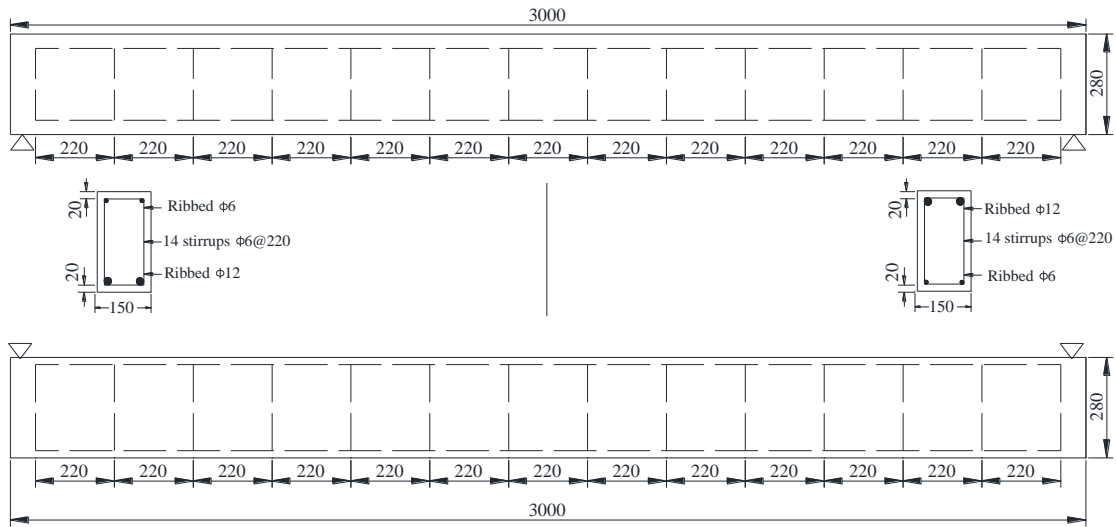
Layout of the reinforced concrete beams (all dimensions in mm)
